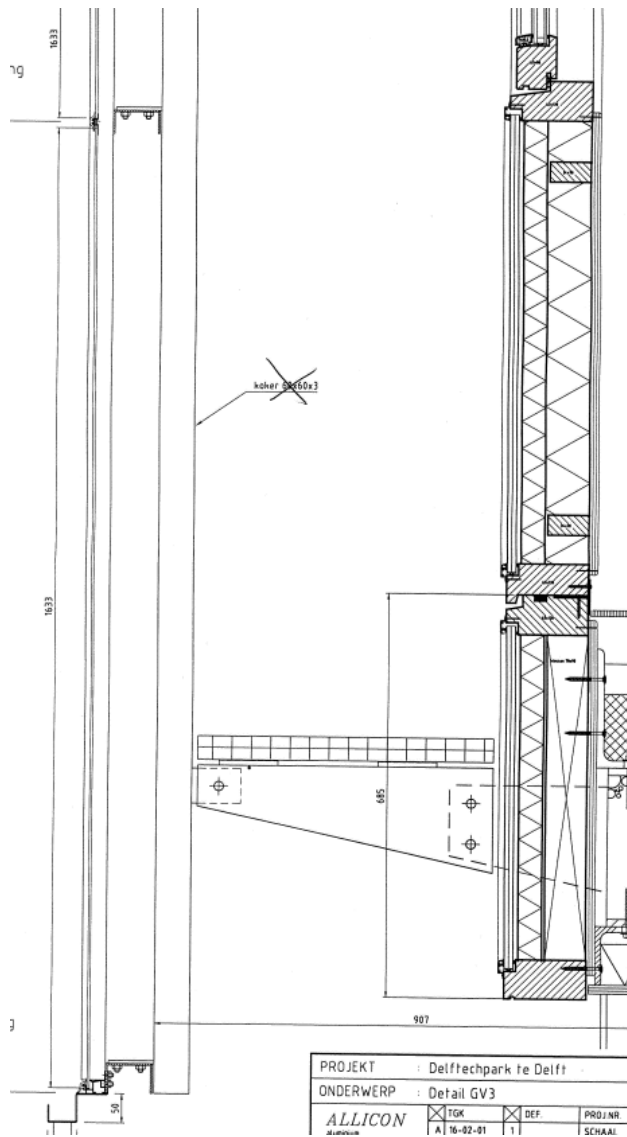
Wall section through the double-skin facade, Source: ABT bv, 2019
